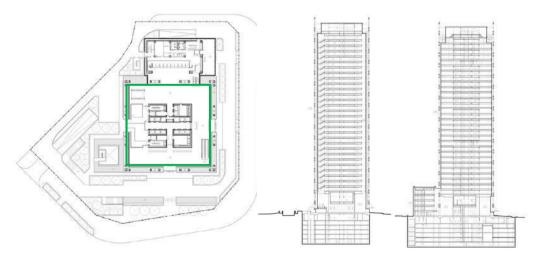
Plan of "Shenzhen Rural Commercial Bank", <u>https://www.archdaily.com</u>
